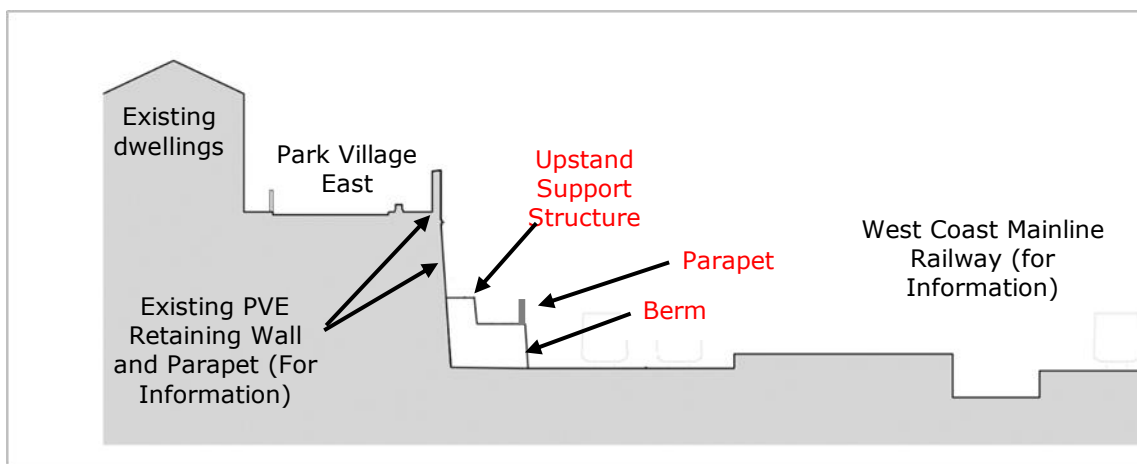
Typical cross-section of the PVE Wall Berm and Upright Support Structure (extract from Sections Sheet 1 1MC03-SCJ\_SDH-AR-DSE-SS01\_SL03-040021 submitted with this application). Elements for approval under this Schedule 17 application are labelled in red.
